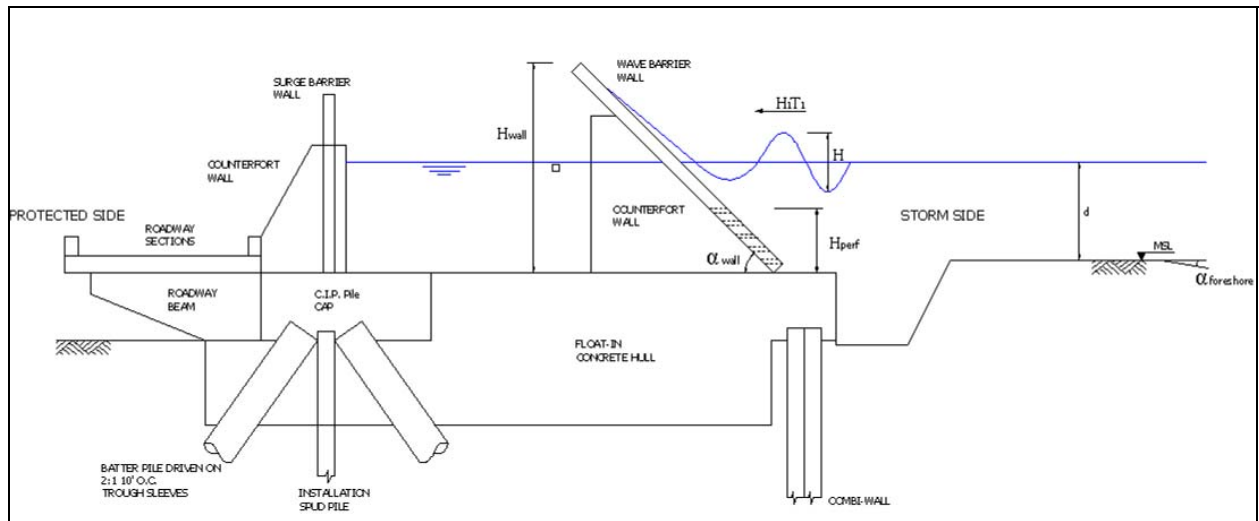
Cross section superstructure of the proposed solution by consortium of Iv-Infra
